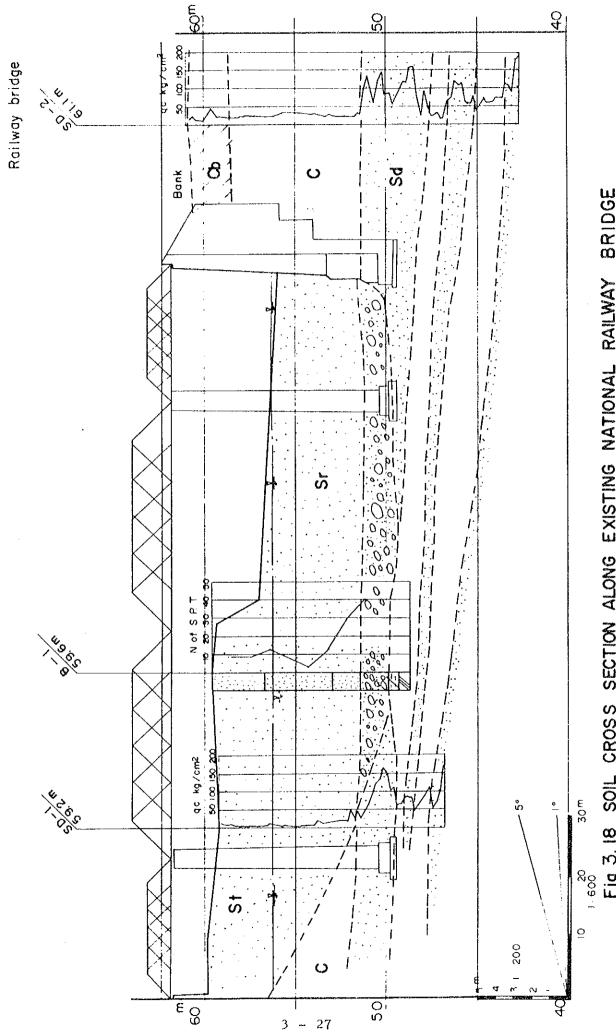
18 SOIL CROSS SECTION ALONG EXISTING NATIONAL RAILWAY BRIDGE
